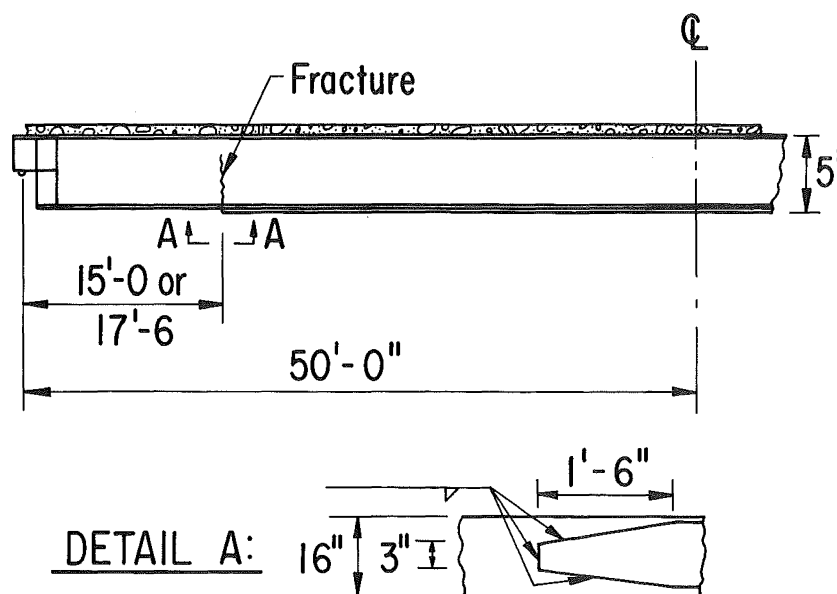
THE FAILED SPAN OF KINGS BRIDGE
